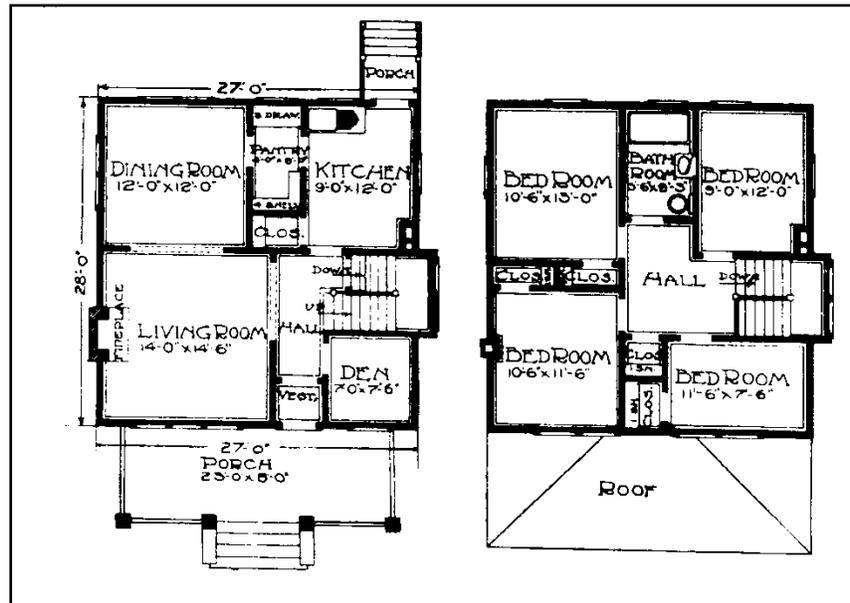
40 First and second floor plan of the “Castleton,” a Sears, Roebuck and Company American Foursquare design.<sup>661</sup>
